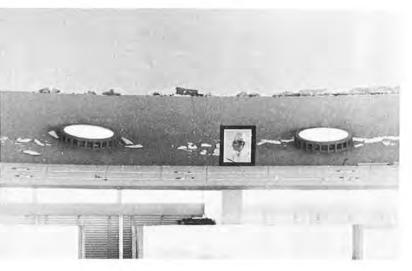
Interior View of Customs House, Showing "Working" of Joint Between Walls and Dome Roof
